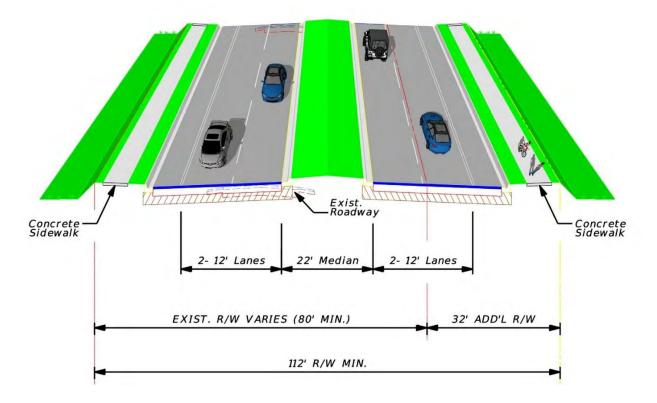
Typical Section - Lee Rd to west of Barry Ave - Maximum ROW w/drainage conveyance ditches
